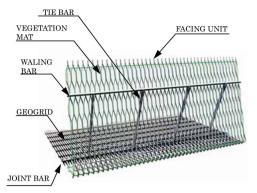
Facing wall unit by L-shaped expanded metal plate.
